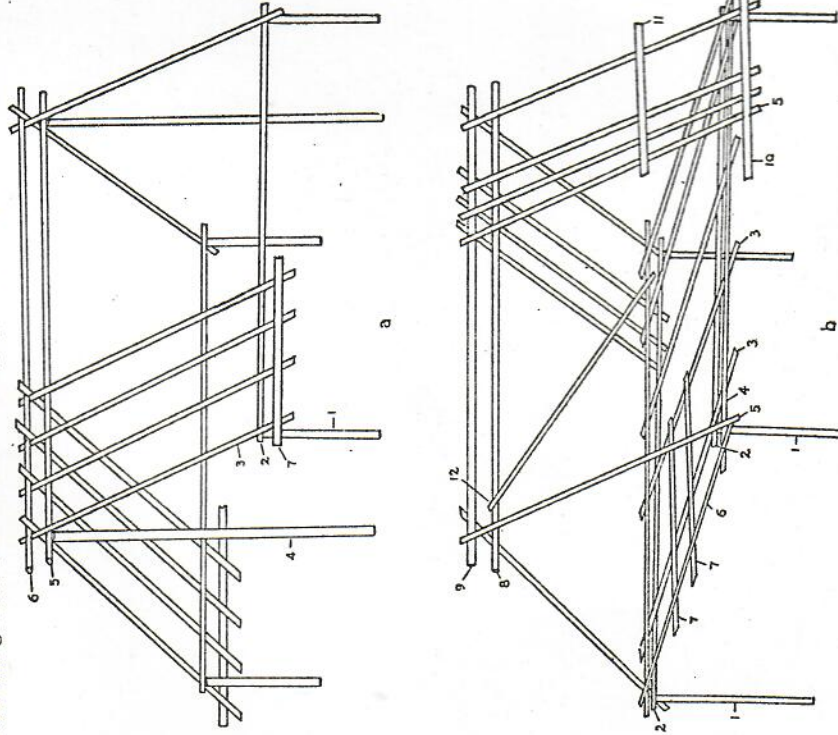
Houses. *a*, framework for *wale toimuku* type house: 1, wall post (*poi*); 2, wall plate (*kaukau matua*); 3, rafter (*waii potu*); 4, ridgepost (*poi tu*); 5, ridgepole (*tau matua*); 6, thatch ridgepole (*tau lua*); 7, purlin (*takikiiti*). *b*, framework for *wakaqayamoia* type house: 1, wall post; 2, wall plate; 3, tiebeam (*oka*); 4, roof plate (*kaukau lua*); 5, rafter; 6, end purlin (end rafters not shown), braced by two supports (*yoka*); 8, main ridgepole; 9, thatch ridgepole; 10, side eaves purlin; 11, mid-way purlin (*talara*); 12, diagonal brace (*yoka*), running from roof plate to main ridgepole.
